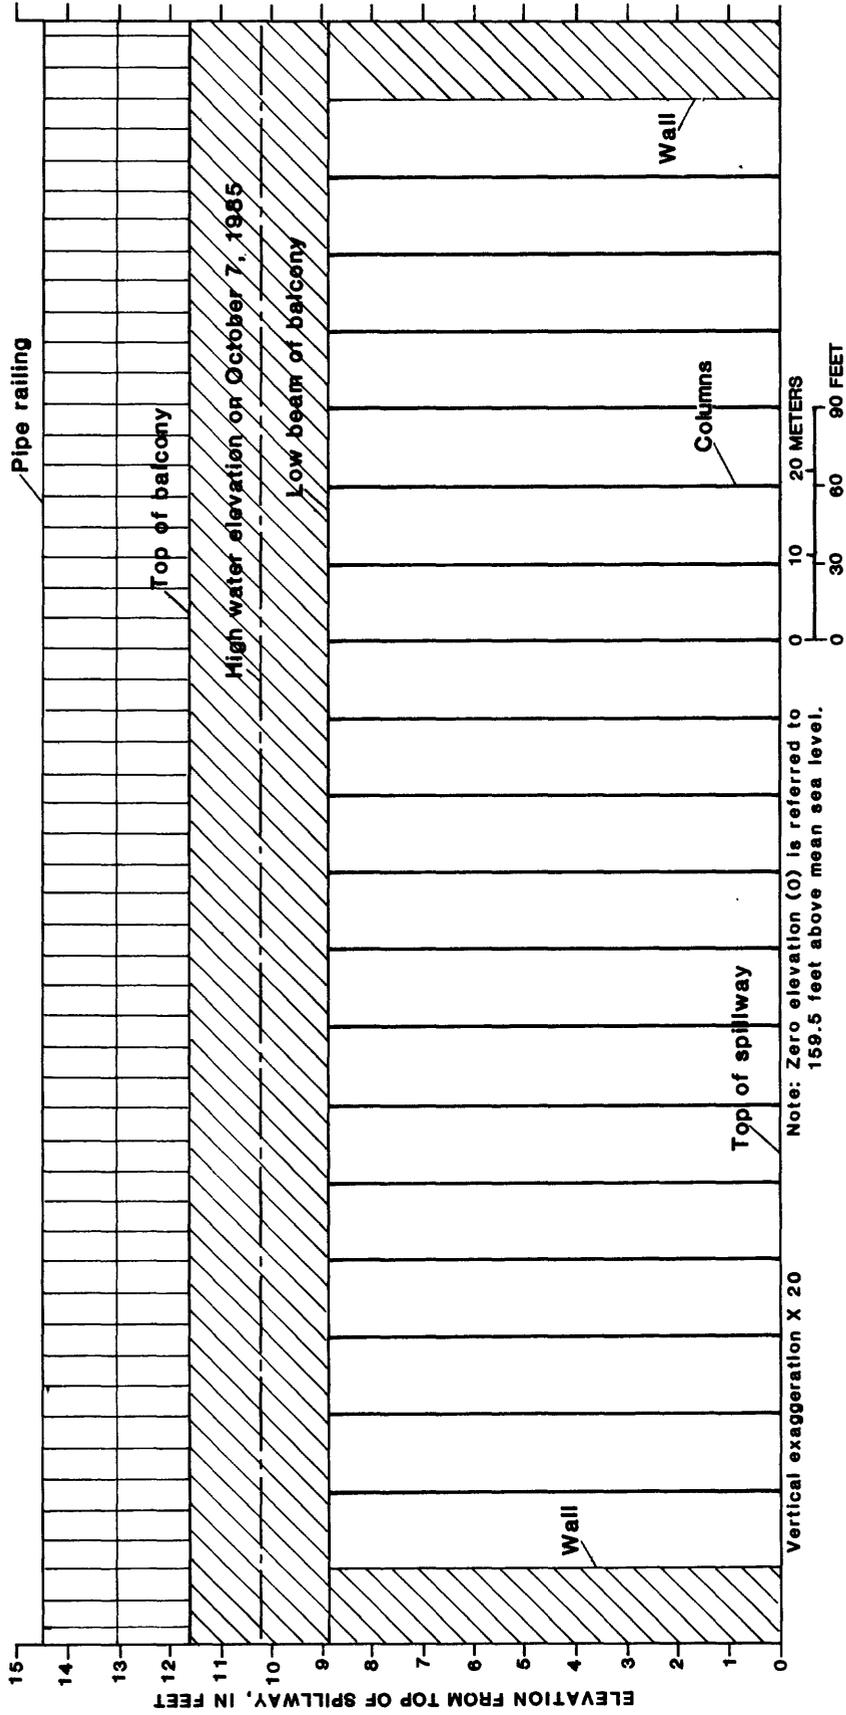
Cross-section surveyed at the Coamo Dam showing elevation of the October 7, 1985 flood.
